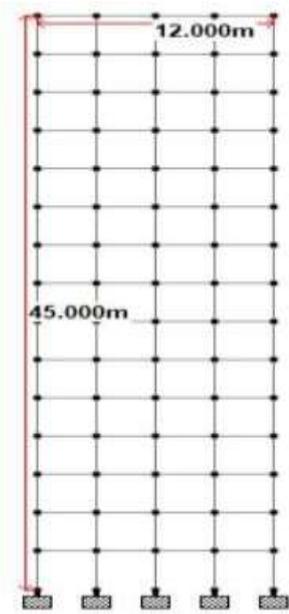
(a) Structural Elevation of RC Frame Model
